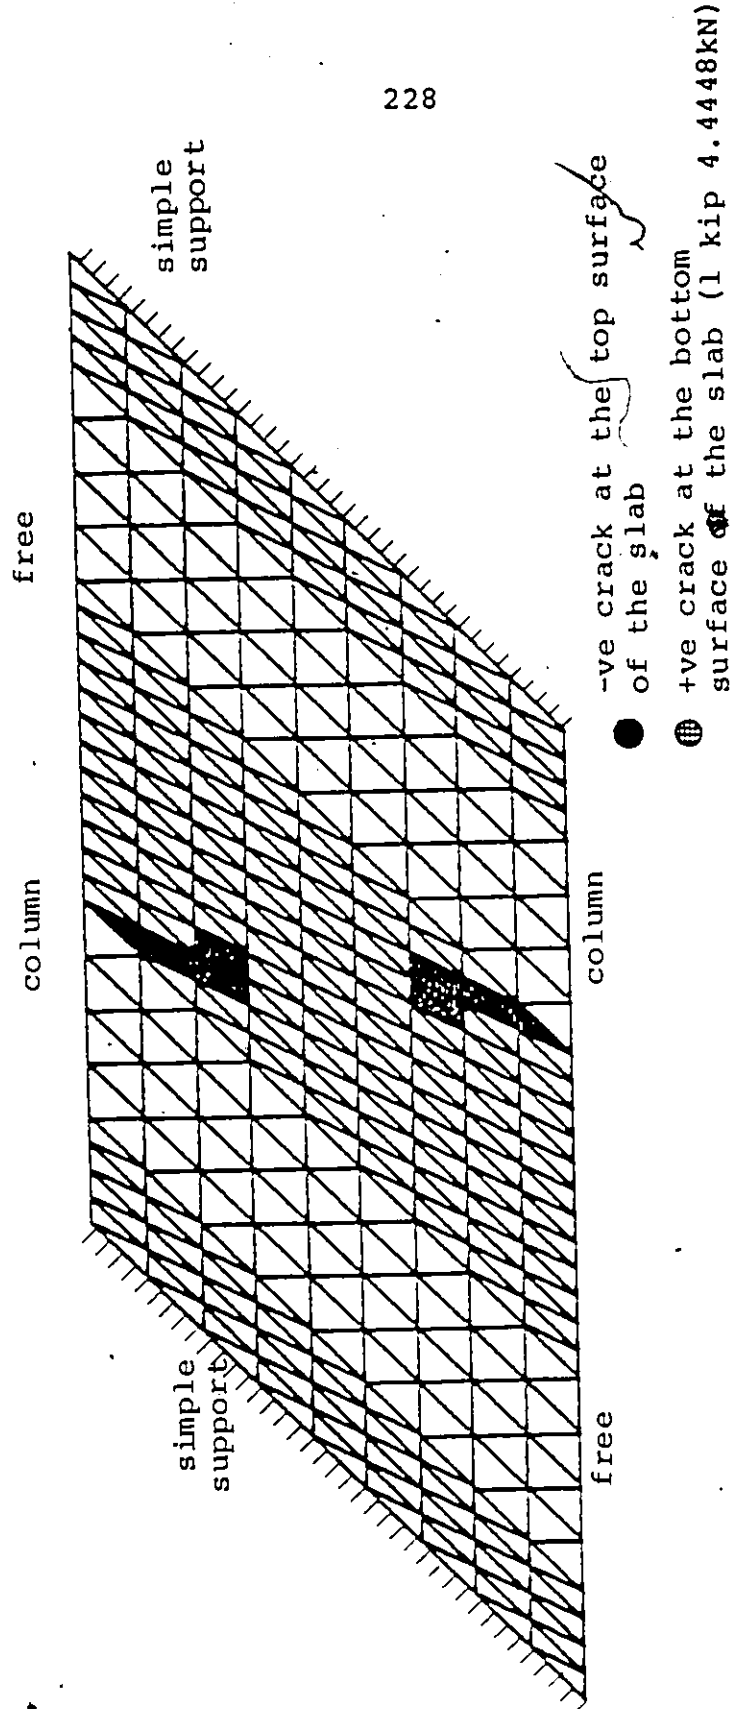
SKEW PRESTRESSED CONTINUOUS WAFFLE SLAB (PC4) SUBJECTED TO TWO CONCENTRATED LOADS OF 15.84 KIPS (CRACKING LOAD) AT THE CENTER OF EACH SPAN PANEL
